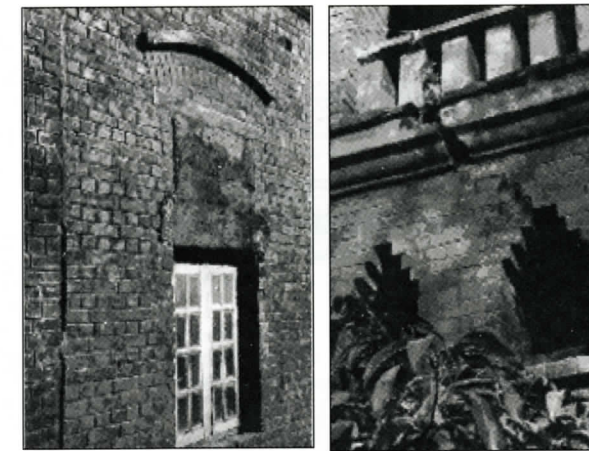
Treatment of openings in the walls and elevation of Chittagong Court Building.
